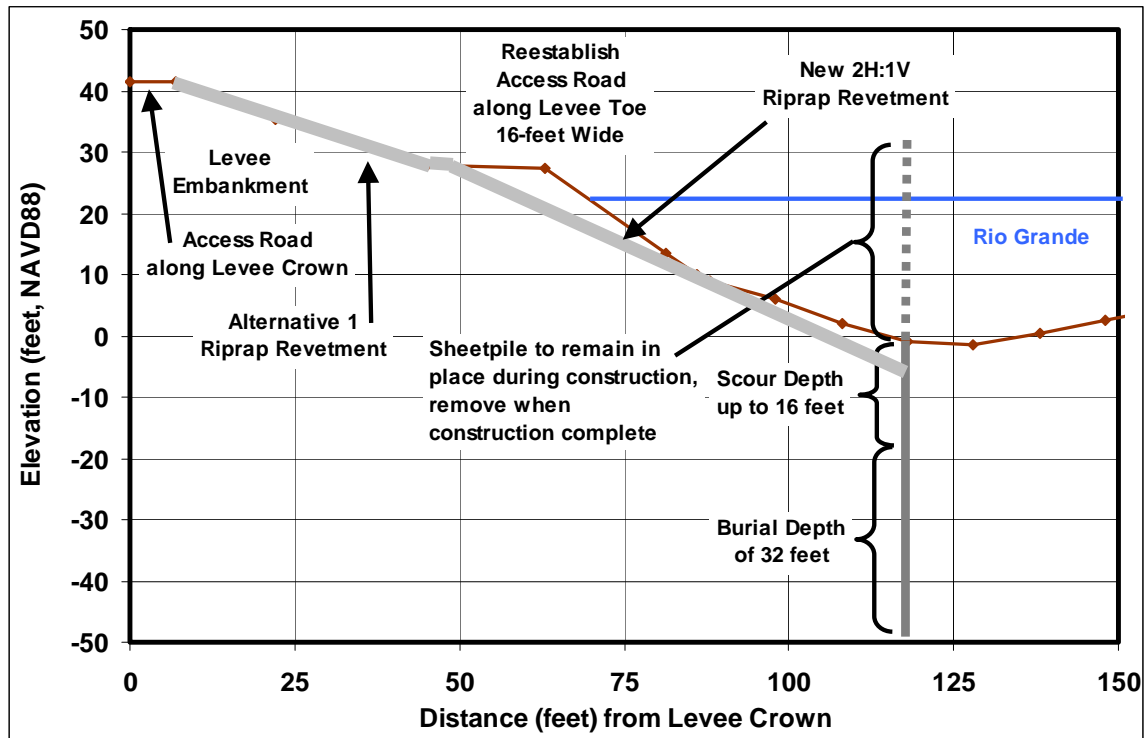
Embankment Protection – Riprap Upper Bank with Sheetpile for Future Scour
